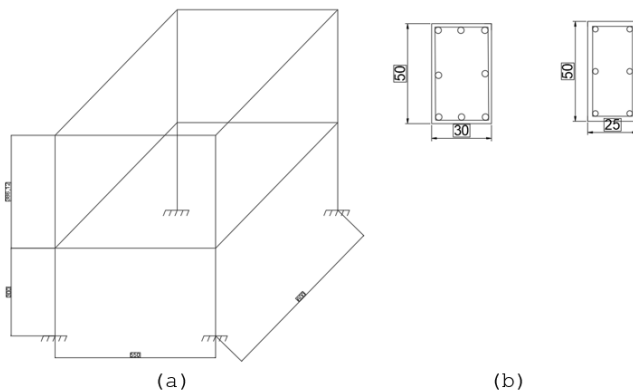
Reinforced concrete frame; a) perspective view, b) Reinforcement bar detail
